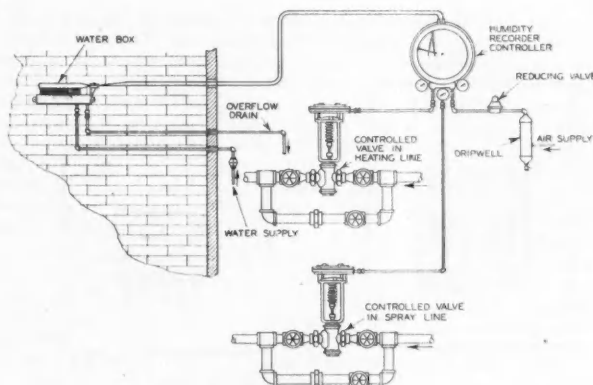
Installation layout of Wet and Dry Bulb Humidity Controller (Courtesy Foxboro Co., Inc.)
